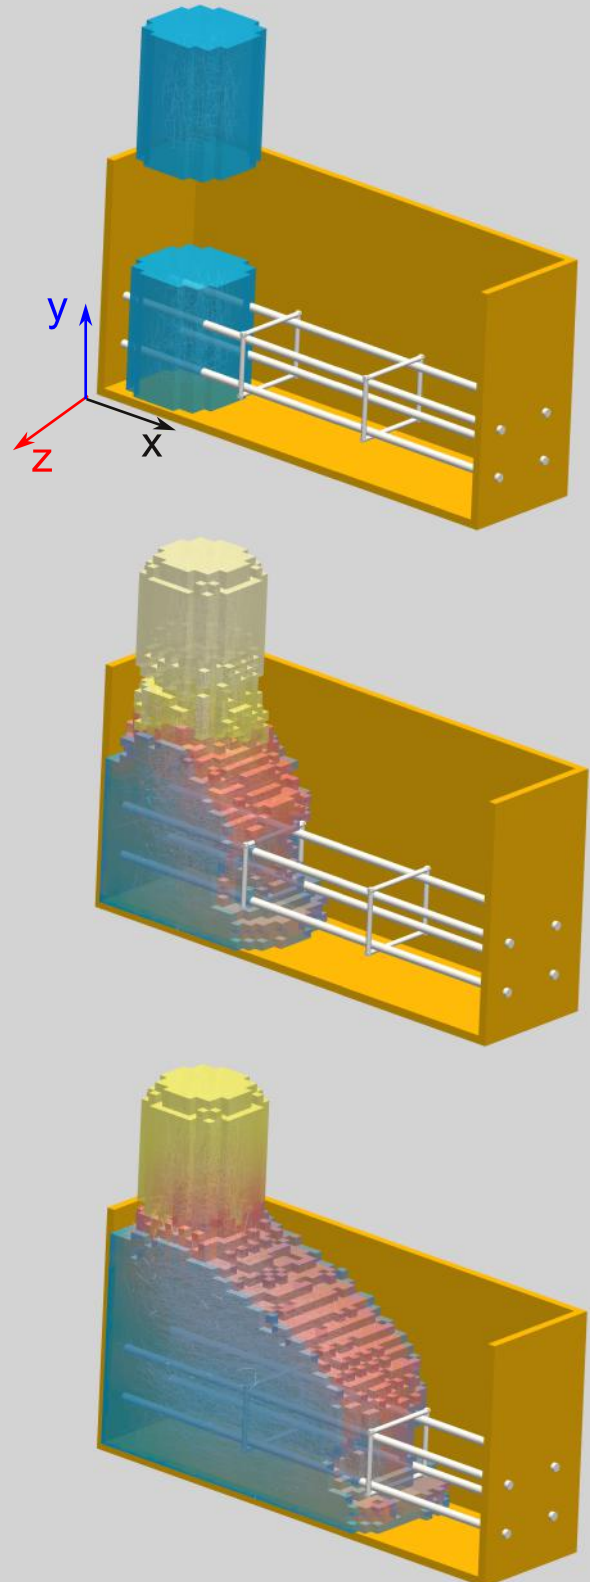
3D view of the initial state and two intermediate states of a standard beam casting with SFRSCC. Longitudinal reinforcement and stirrups are included.
